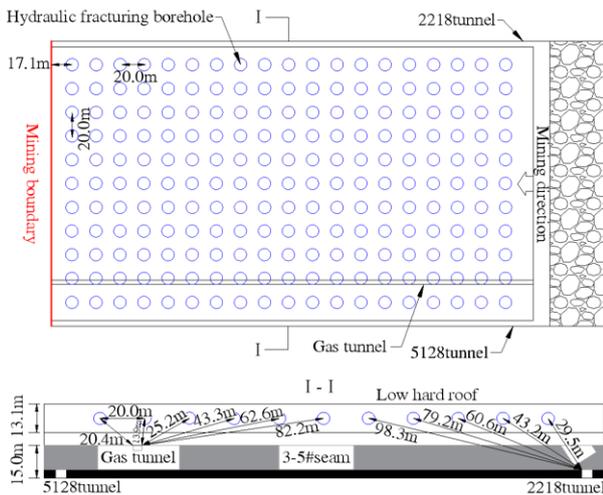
Hydraulic pressure cracking borehole arrangement.
